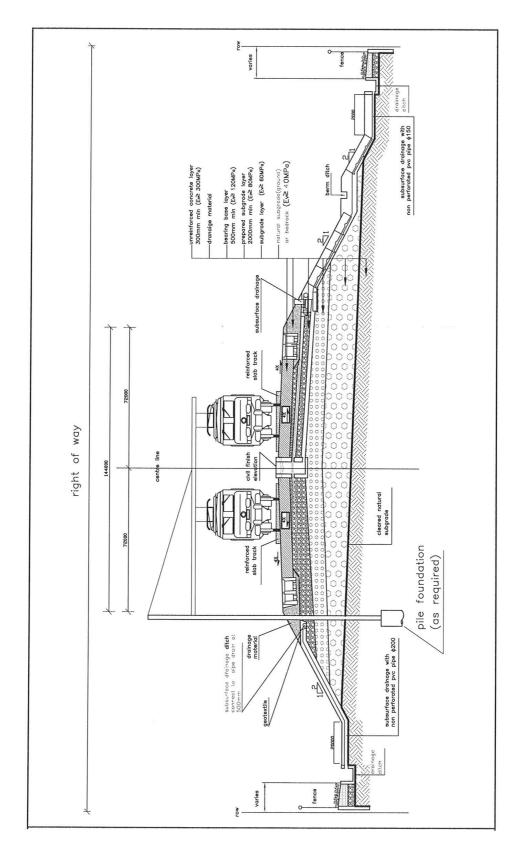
Typical fill section slab-track type high-speed train embankment usable in Japan/Taiwan
